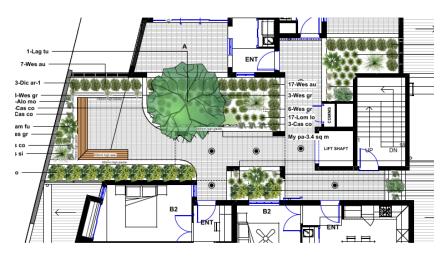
Extract of the proposed landscaping plan showing the communal open space.
